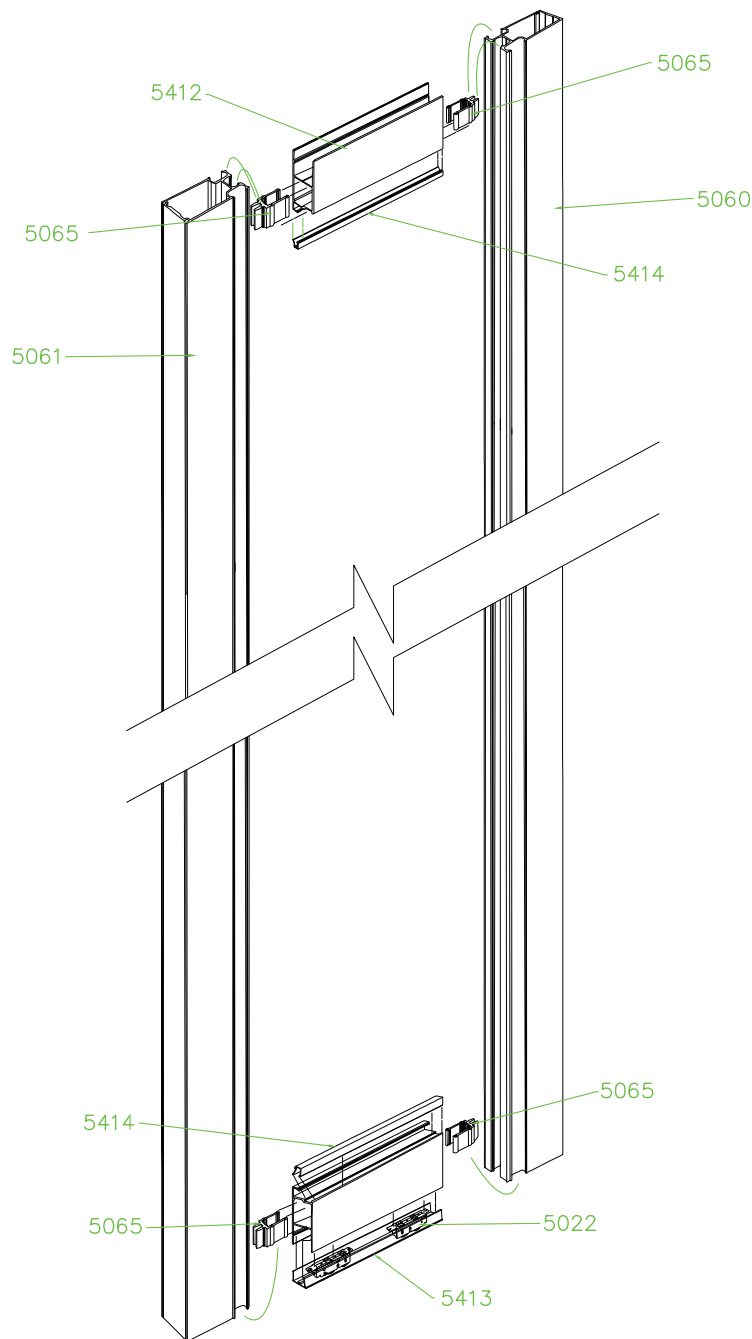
| Horizontal Detail of 5000 Door and Main Frame
